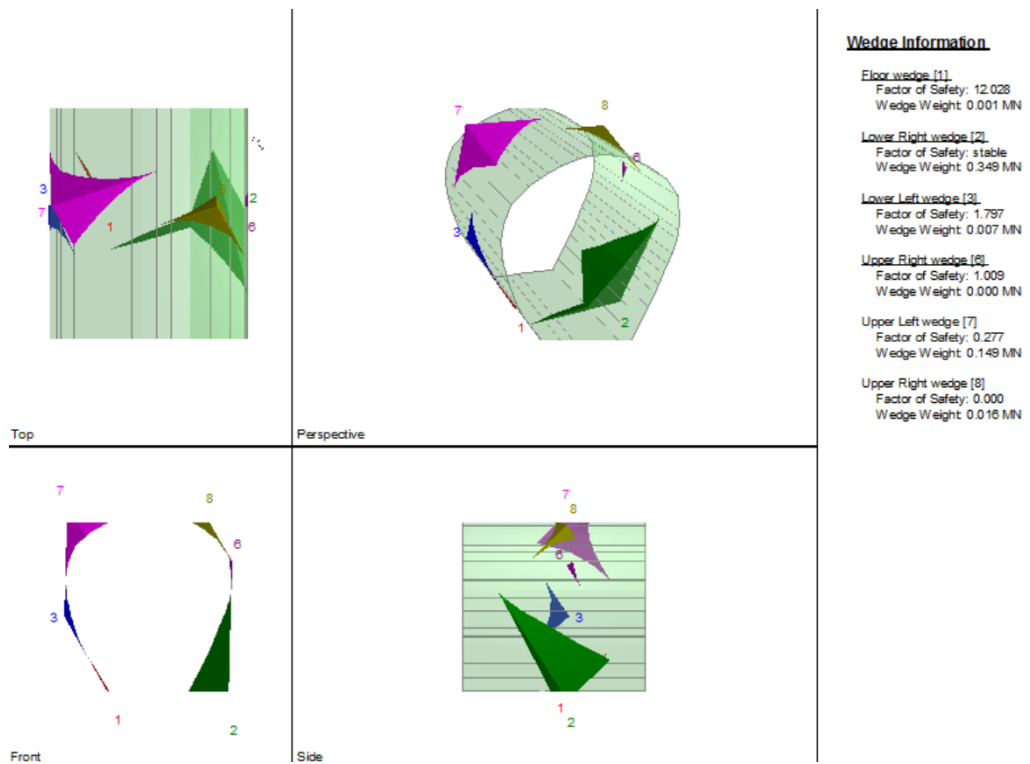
The unstable wedges formed on the top right roof corner and top left roof corner of the PT in segment A-B
